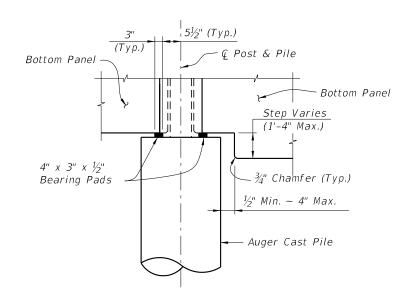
DETAIL "A" (Back Face Chamfer Shown Front Face Chamfer Similar)
